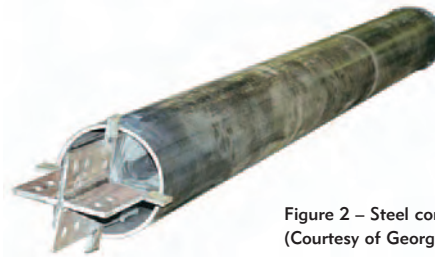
Steel core inserted in steel tube casing (Courtesy of George Third and Son)
